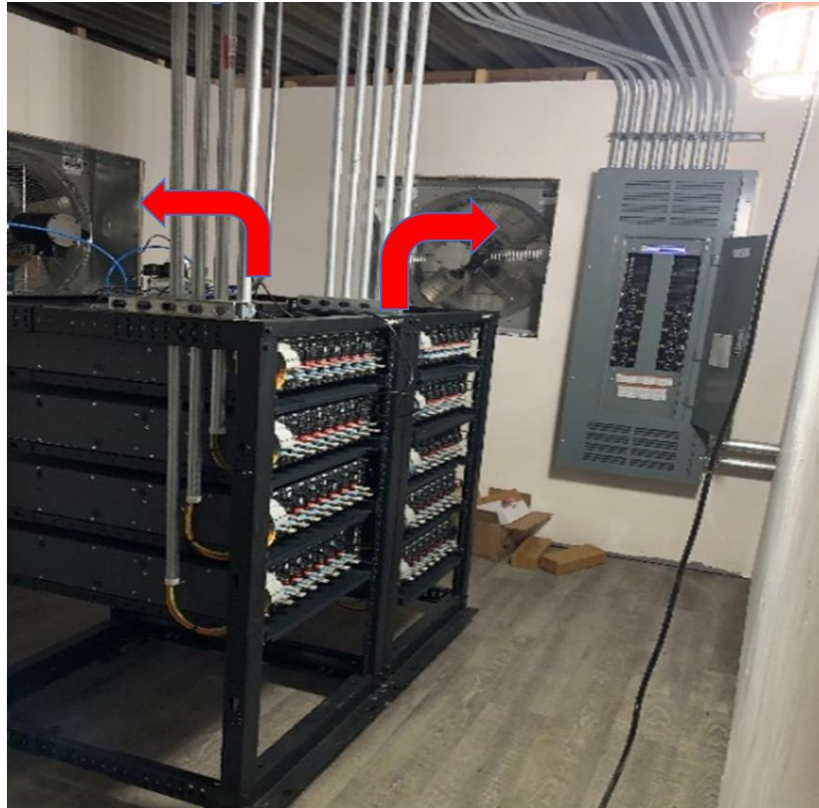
Remote drive heat can be exhausted outside the facility or back into the workspace.
